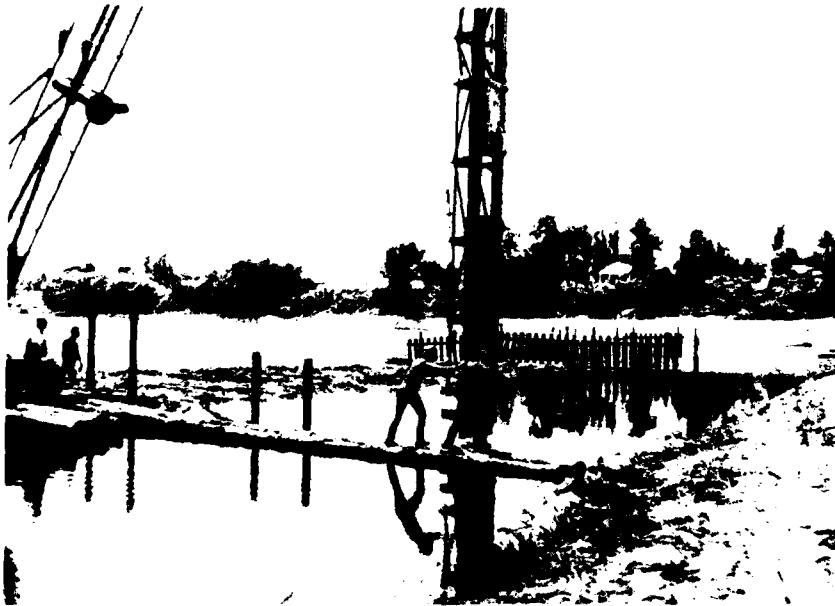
TIMBER JETTIES DURING CONSTRUCTION. 24 AUGUST 1978.
